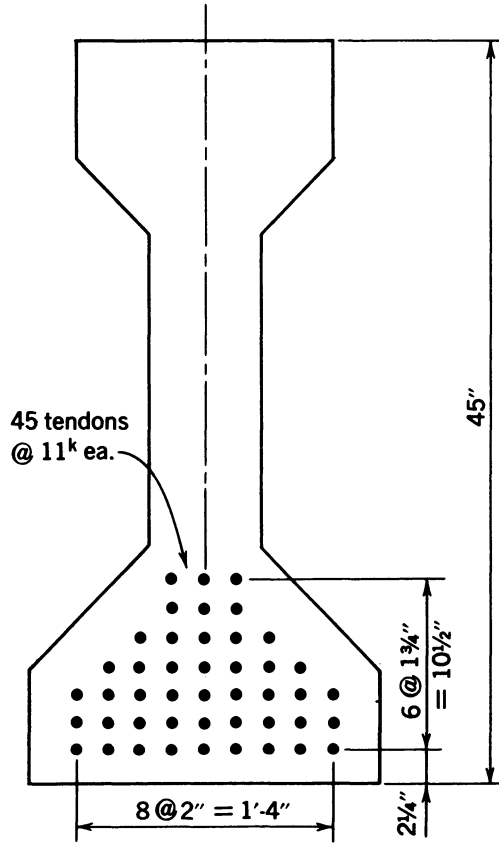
End elevation of pretensioned concrete beam, showing tentative tendon layout, I.P. 9-14.
